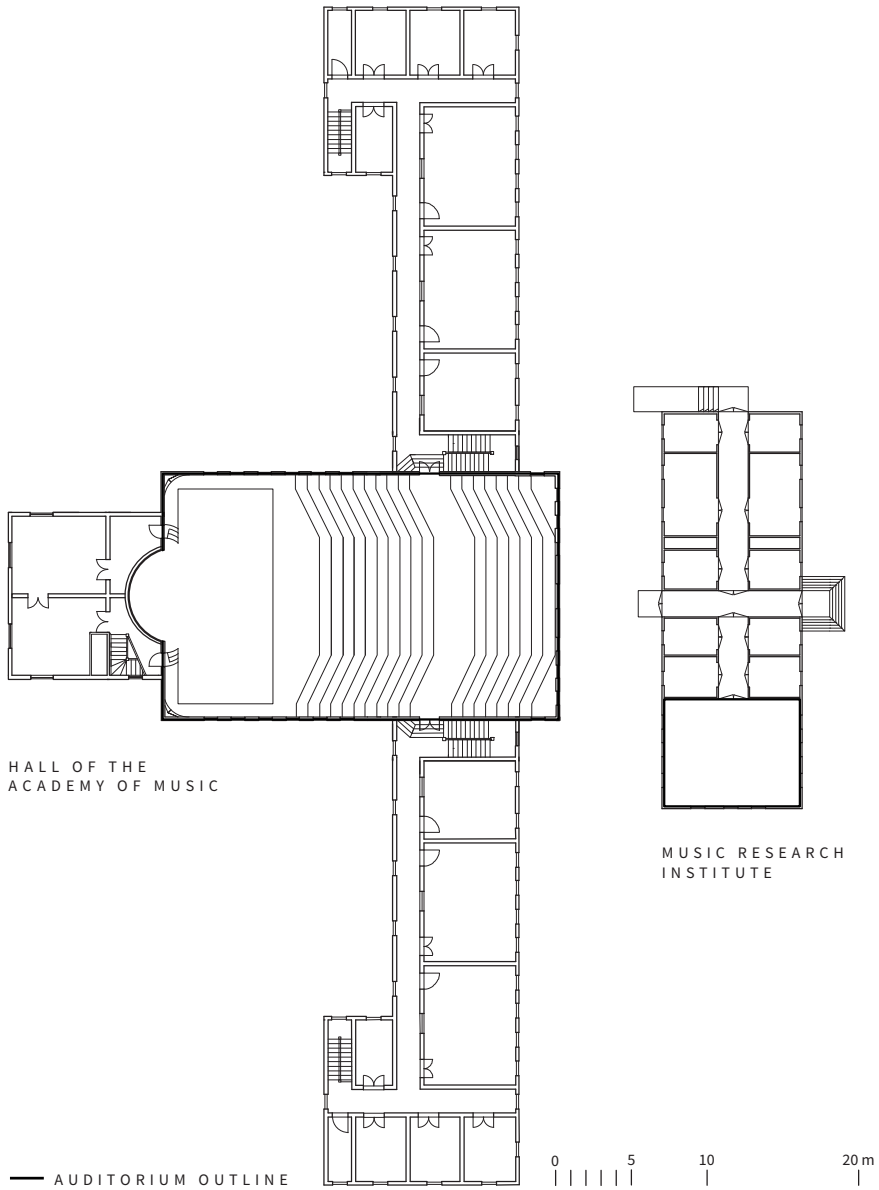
Floor plan comparing the main building of the Tokyo Academy of Music (left), opened in 1890 with a floor plan of about 410 m² with the building where the Music Research institute was accommodated from 1880 (right), with a floor space of about 60 m², Scale = 1:500.
